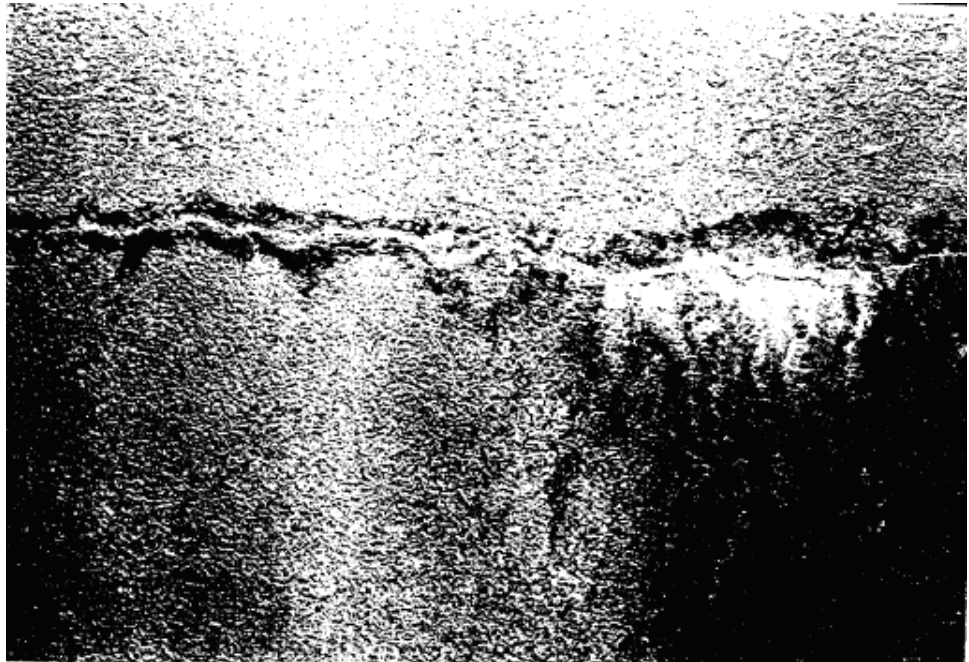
(Exhibit 109) Minor Longitudinal Crack with Efflorescence
